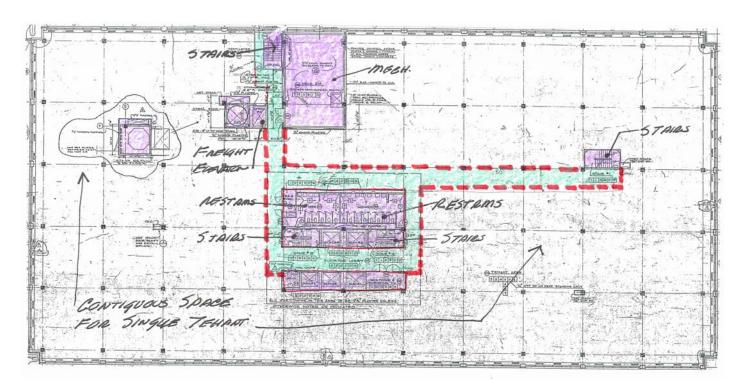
Mayflower Building typical floor plan showing dedicated space for core areas, stairs and corridor for multi-tenant spaces. Single tenant uses would provide large expanse of open floor areas to accommodate data processing uses.
